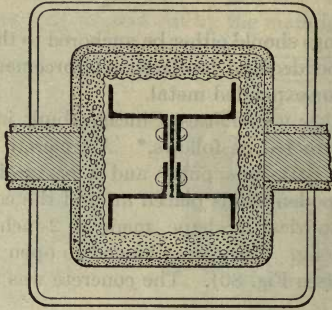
Concrete Column Protection, U.S. Appraisers' Warehouse, N.Y.
